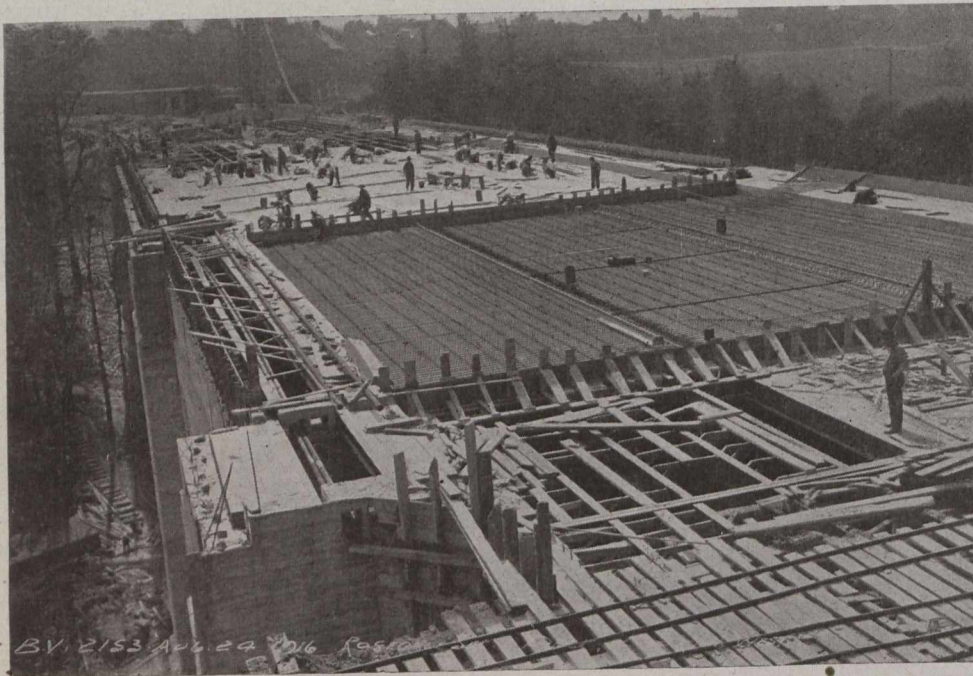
Upper Deck, Rosedale Section, Looking West.
